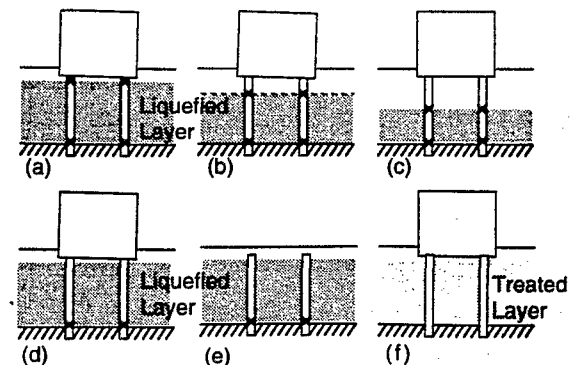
Typical damage pattern of buildings on pile foundations subjected to lateral spreading in 1995 Kobe, Japan earthquake (Tokimatsu, 1999).
